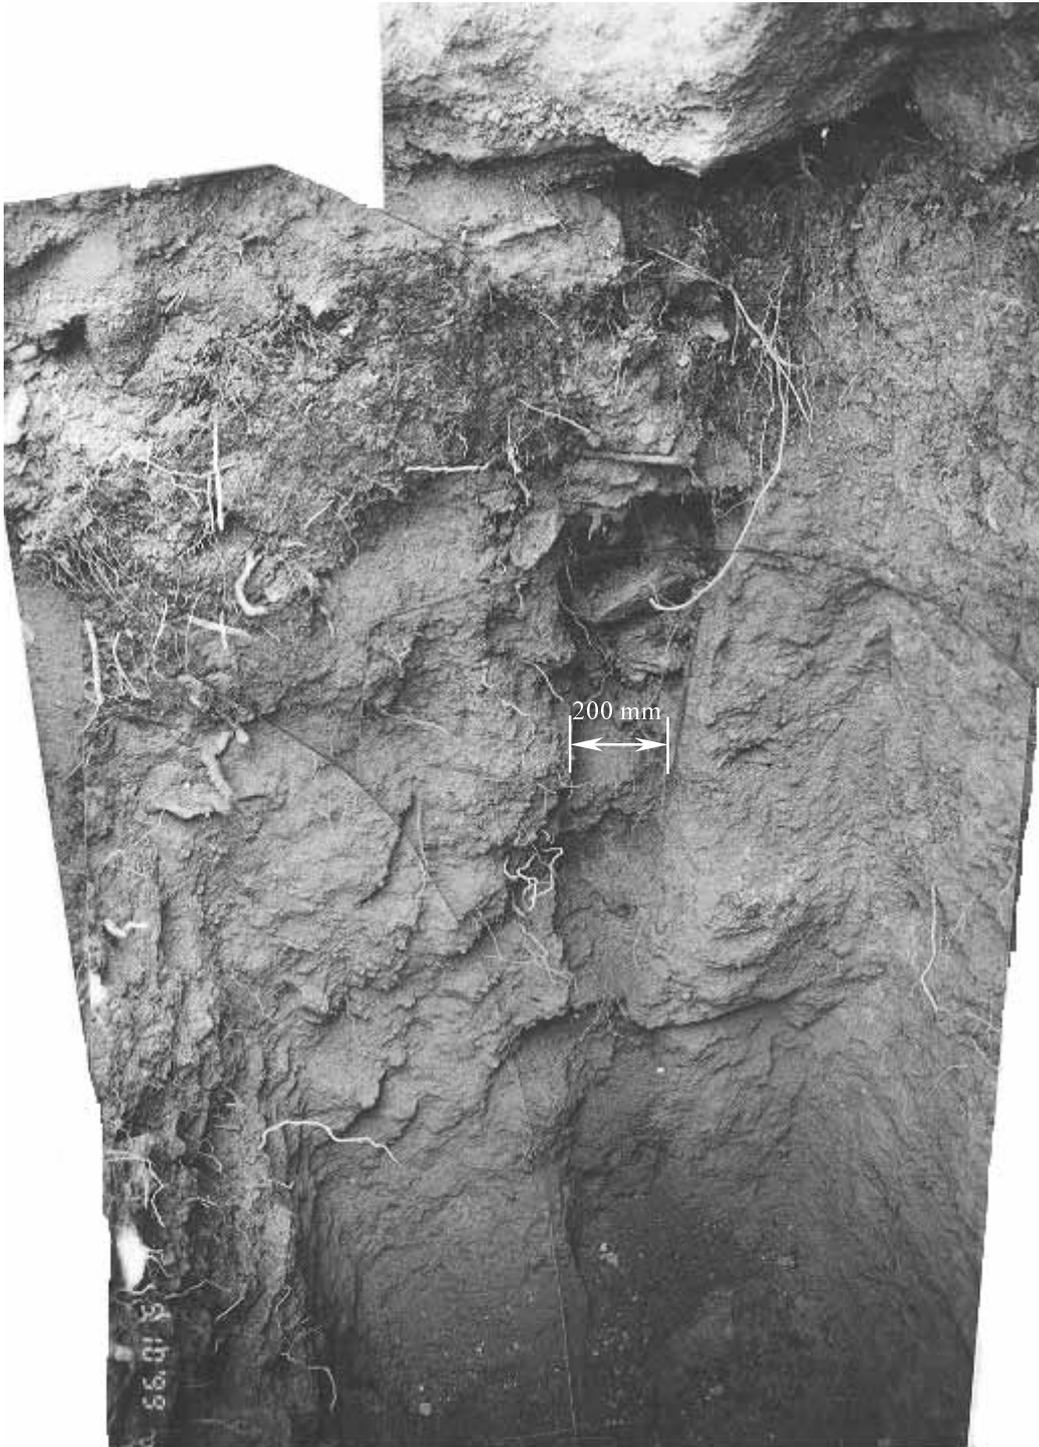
View of Infilled Tension Crack Identified in Trial Pit TP2
